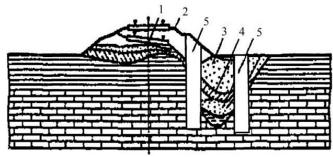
The diagram of earthwork stabilization in karst-hazardous areas: 1, 2 – rod positions after collapse and restoration, respectively; 3 – soils of the slid part of the embankment; 4 – karst funnel; 5 – columns of reinforced soil
